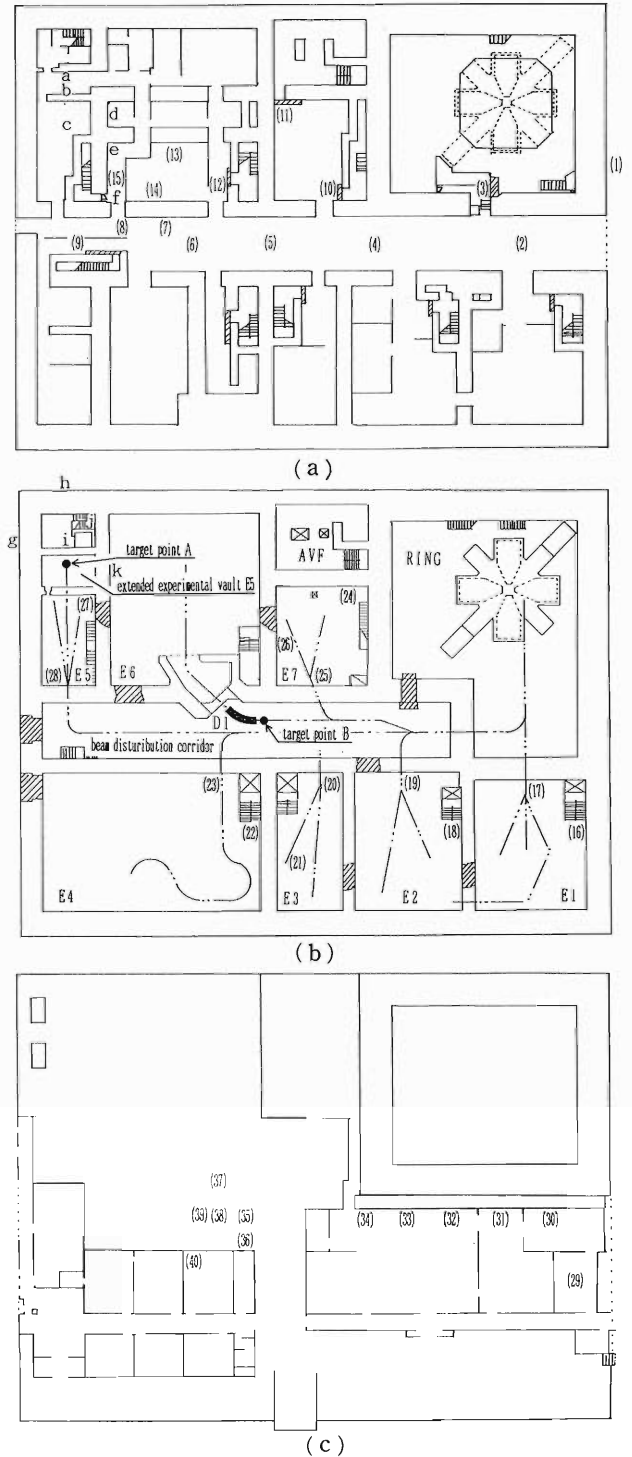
Layout of RIKEN Ring Cyclotron facility as of 1990. a : Plan view of basement 2th floor; b : Plan view of basement 1th floor; c : Plan view of first floor. Leakage radiation doses measuring points are denoted by alphabets and the number in the parentheses.
